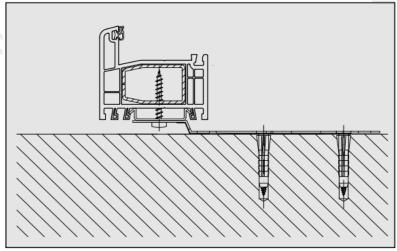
Mounting with frame fasteners and length recommendations depending on the material
